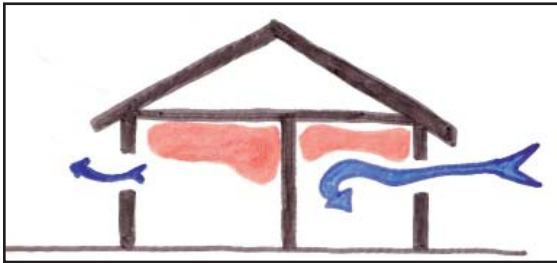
Cross ventilation with drop ceiling and partition wall with door closed warm air trapped inside.
